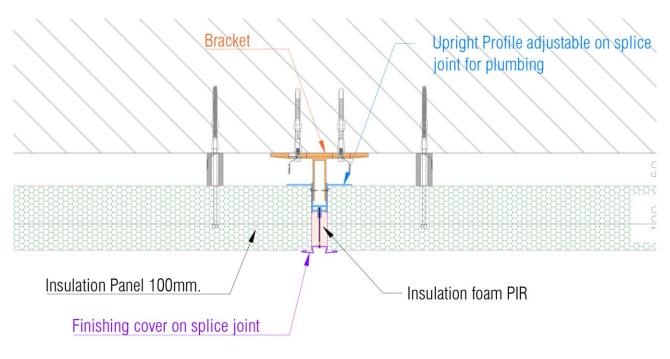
Detail drawing of façade system mounting profile [drawing created using AutoCAD]
